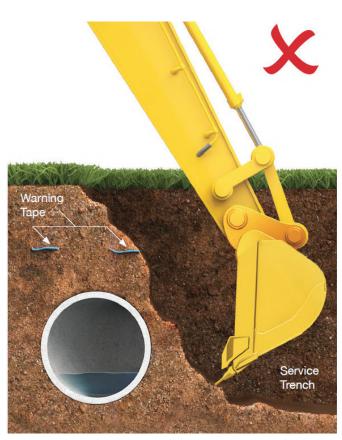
Typical excavation direction - can cause damage before pipe is uncovered.
